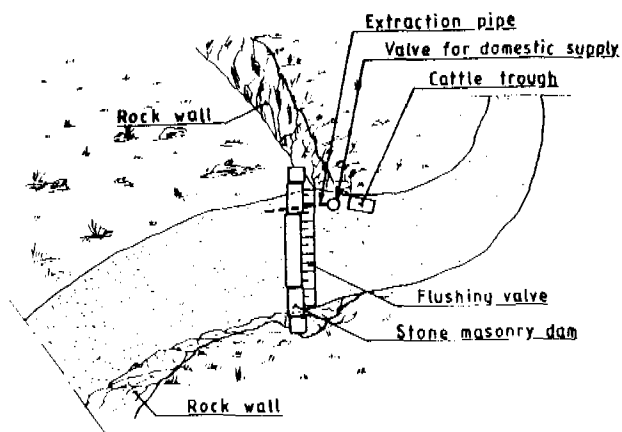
Plan of Kyandili sand-dam site, Machakos.
